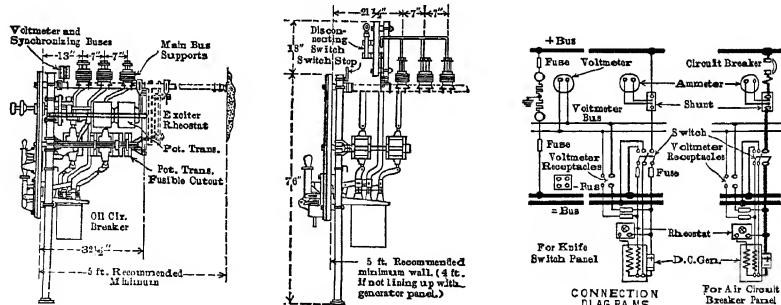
Construction of Small Plant Generator and Feeder Panels
